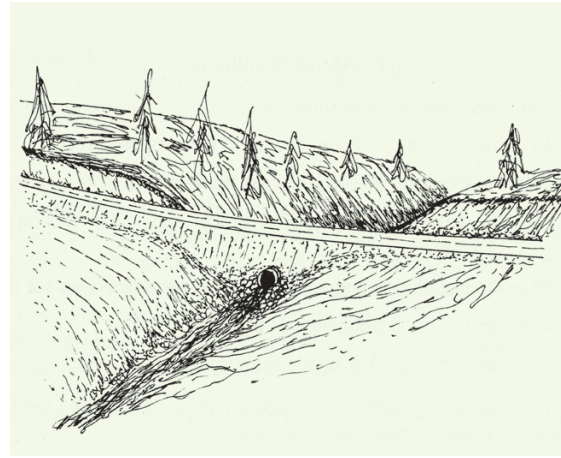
Stream crossing with diversion potential. Stream-flow would be diverted down the road toward the right side of the picture if the culvert inlet plugged and streamflow reached the road surface.
